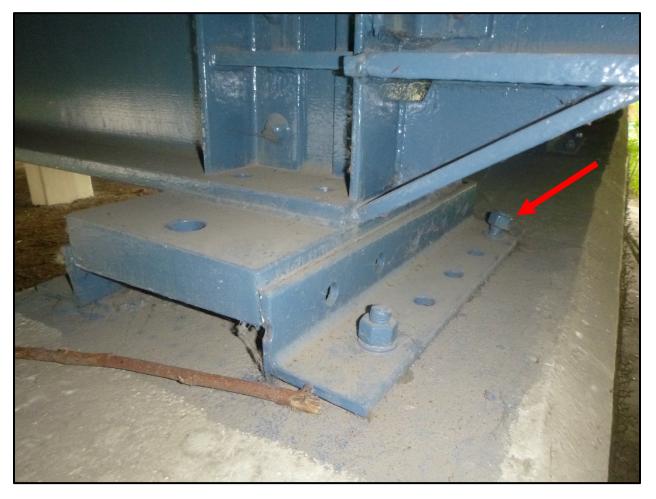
Bent Anchor Rod and Loose Nut on Northeast Corner of S05 Bearing at Pier 12E
